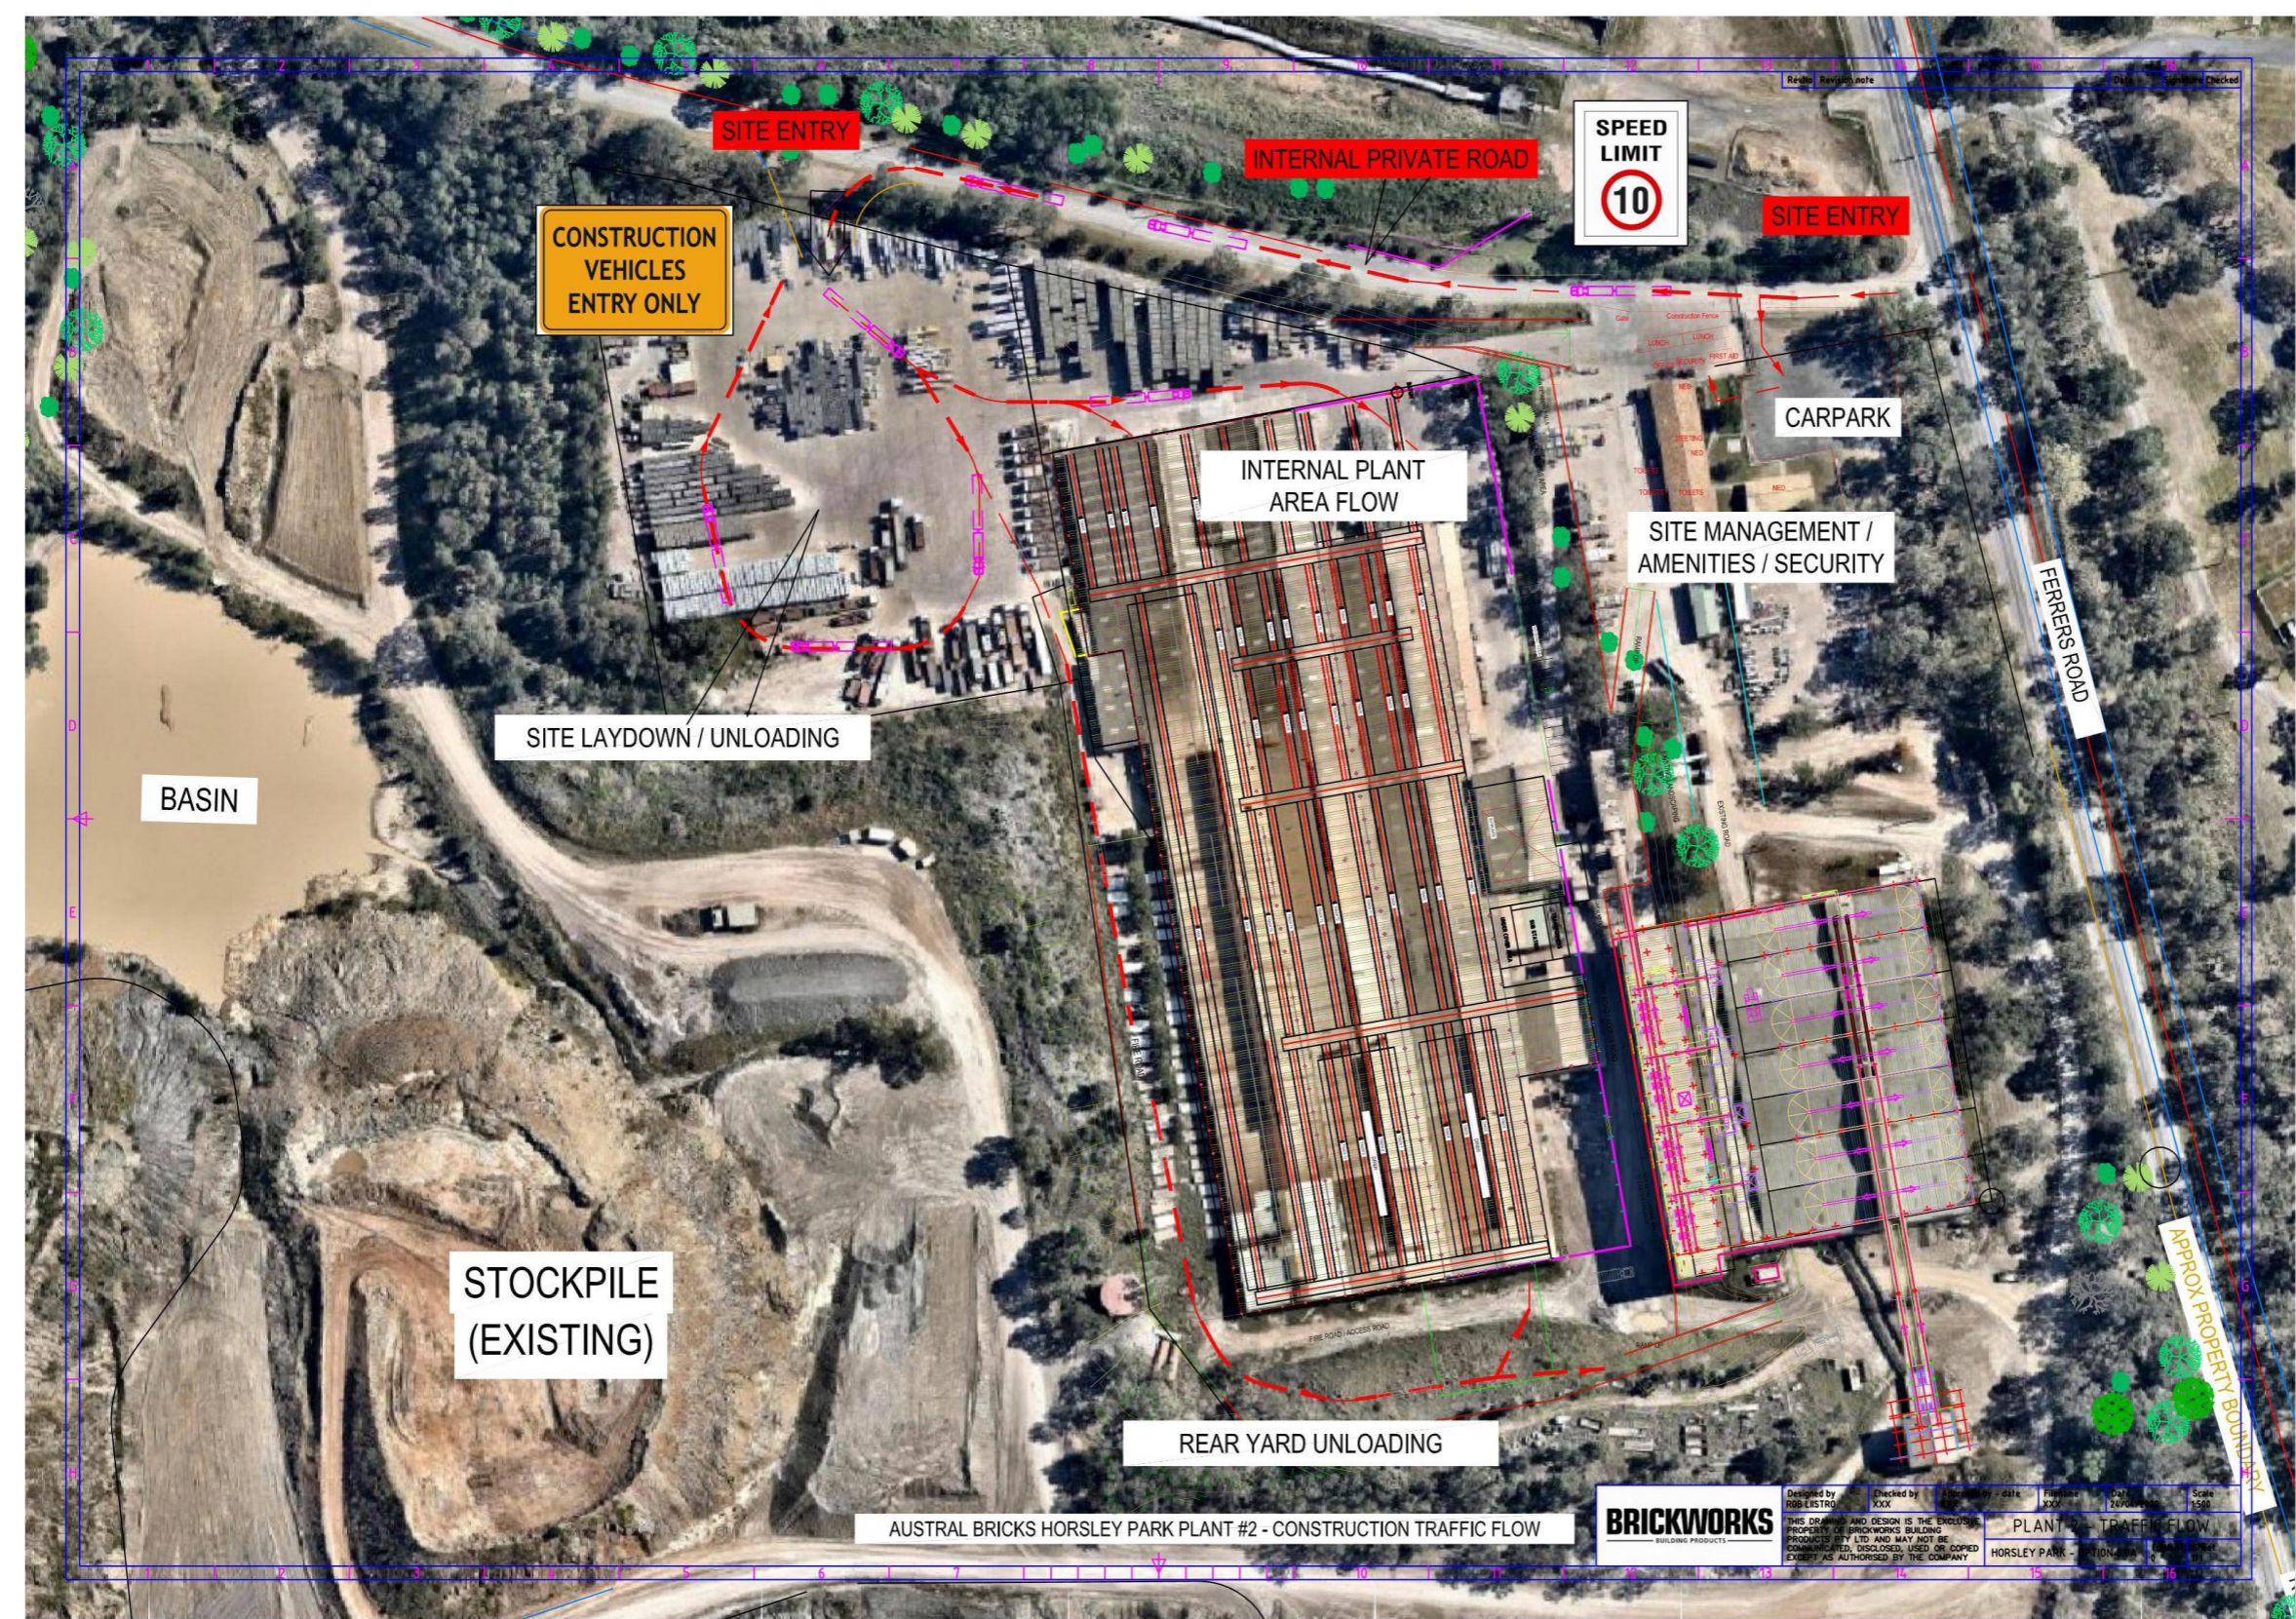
Traffic patterns for Plant 2 Upgrade from Brickworks Management
